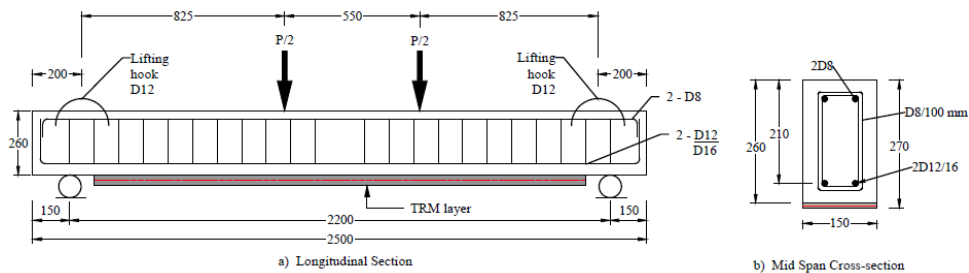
Longitudinal and cross-sectional details of typical FRCM repaired beam specimen (All dimensions are in mm)
